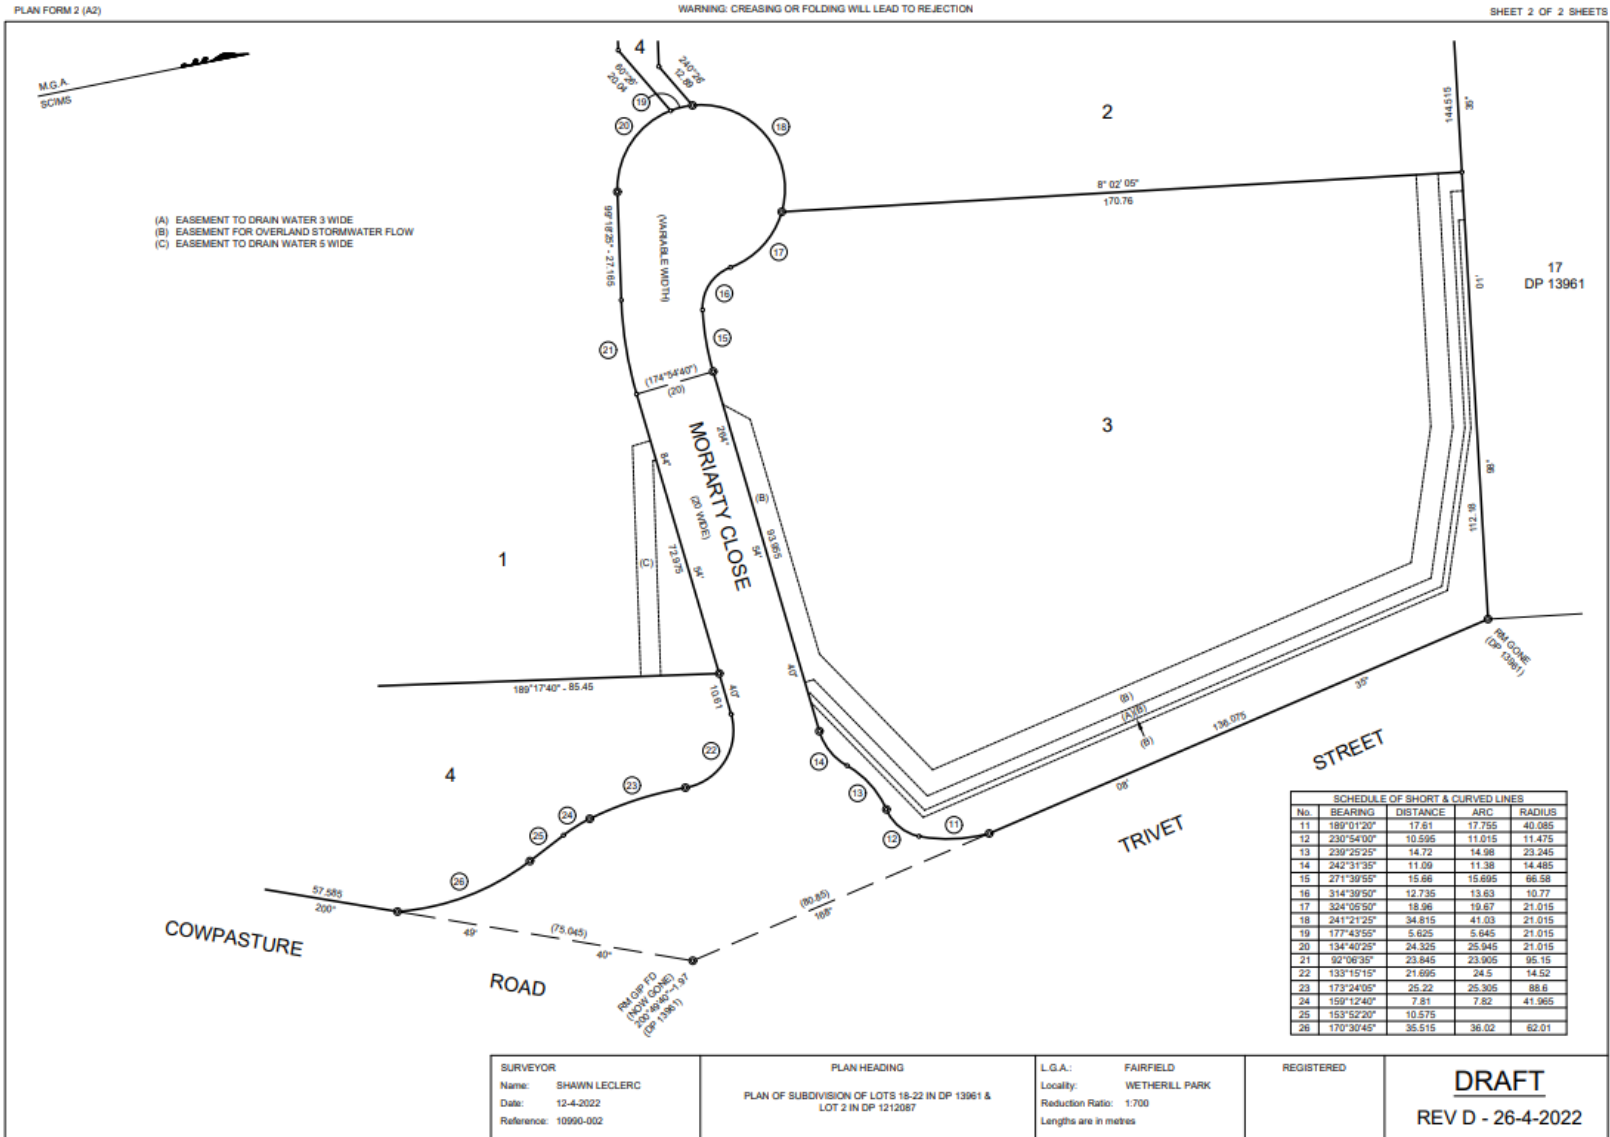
Plan of Subdivision, Drawing No. 10990-002 Rev D - Sheet 2, prepared by Shawn Leclerc and dated 26 April 2022
